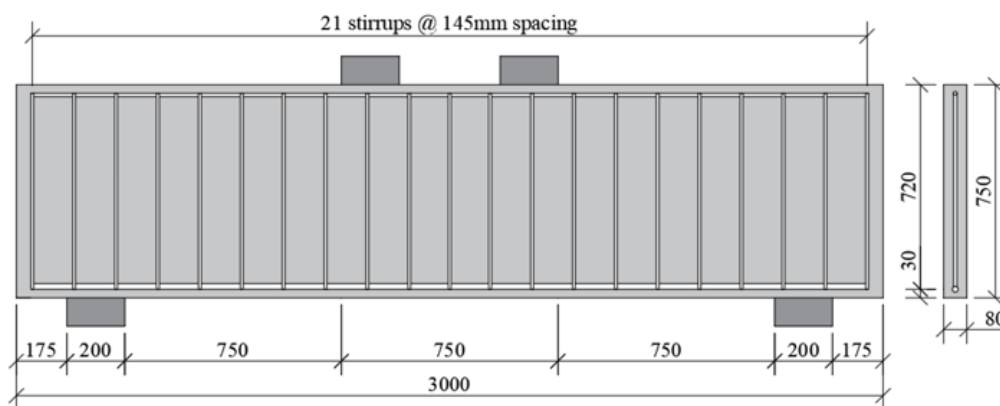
Proposed beam cross-section and its passive reinforcements (units in mm)
